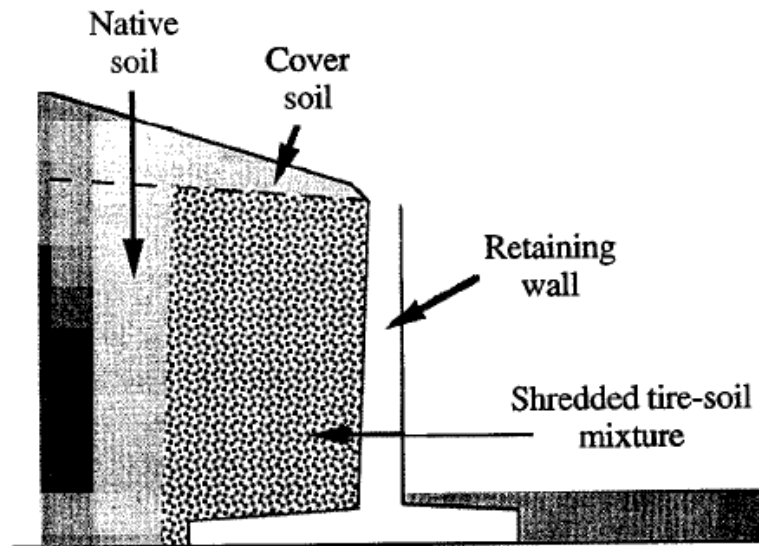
Shredded tires used as backfill for a highway retaining wall (Benson, 1995)
